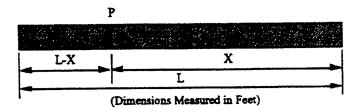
Maximum stringer or girder shears for live loads (reference [1])
